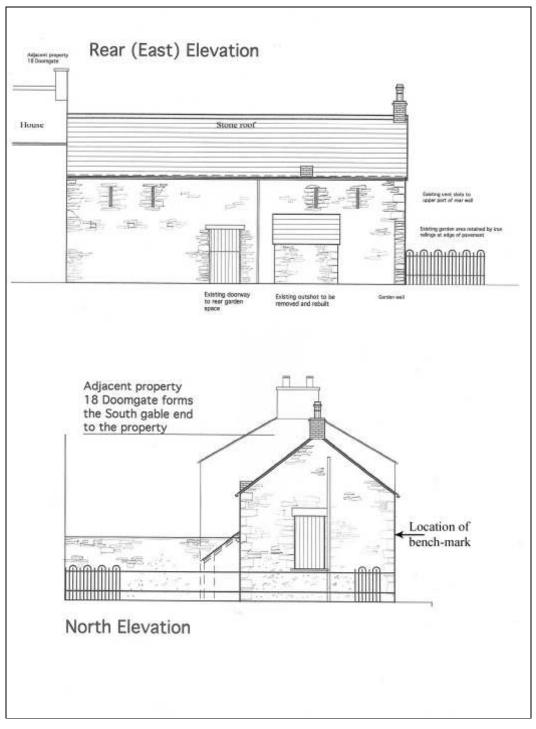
East and north elevations (Scale 1:100) (Drawings courtesy of Foskett Hylton)
